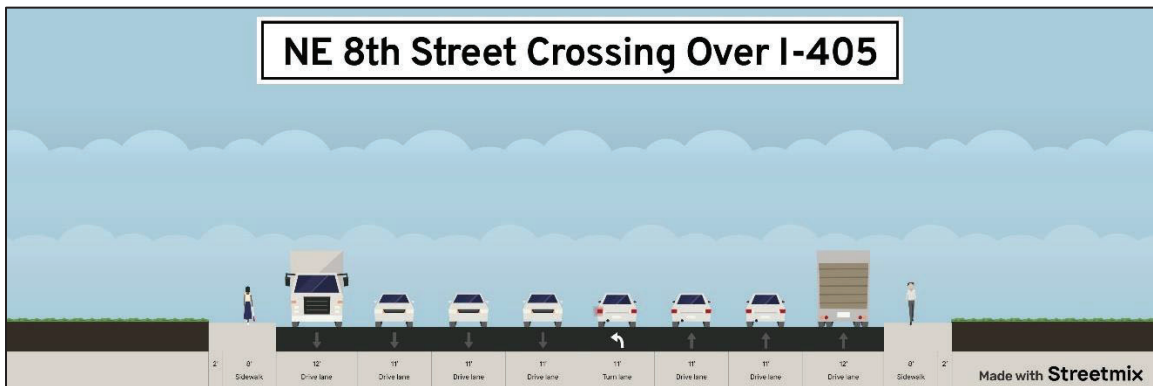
Existing NE 8<sup>th</sup> Street Cross-Section for the Crossing Over I-405 (facing west)
